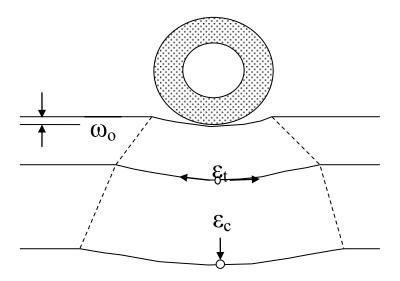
Mechanistic Design Theory (Failure Modes and Critical Strains in Flexible Pavement)
